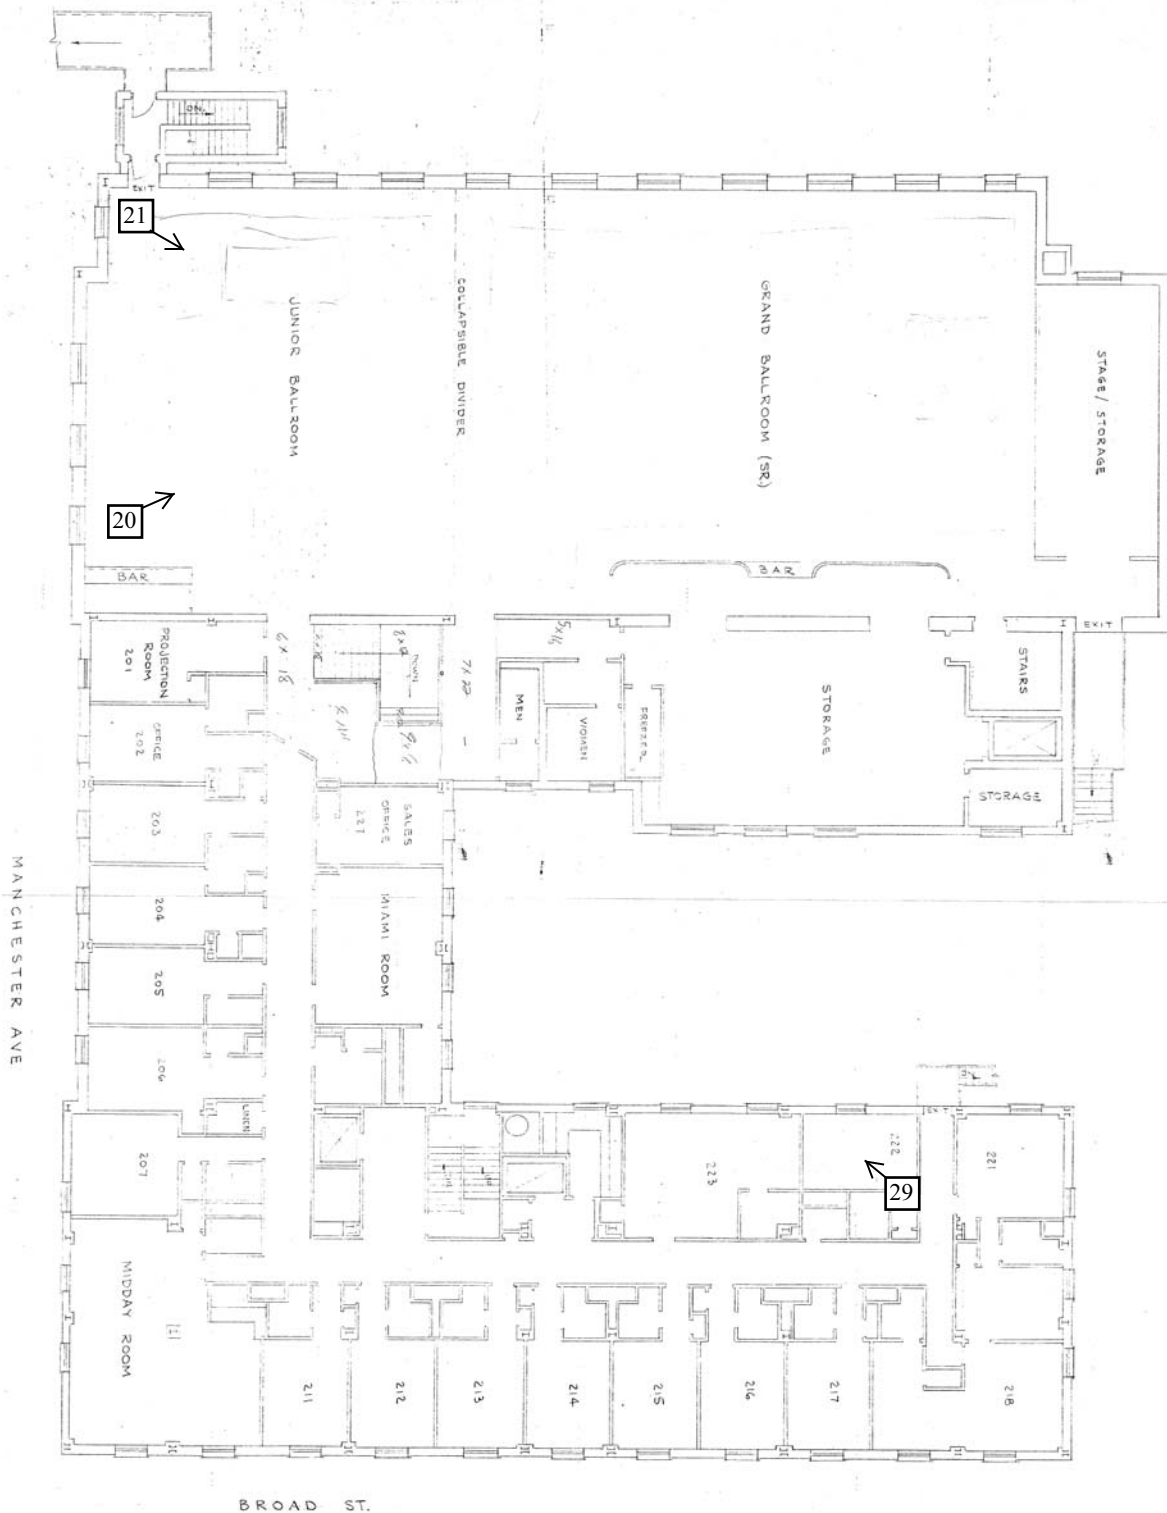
Floor plan of Second Floor of the Hotel Manchester in Middletown, Ohio with photo locations
